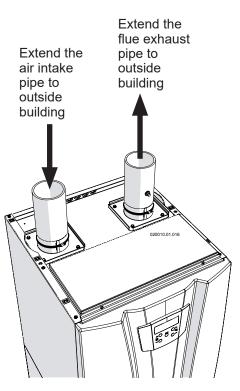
Stainless steel air intake/vent connection correctly in place
